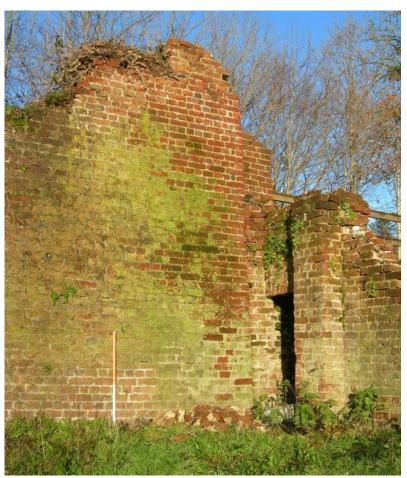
West wall of the south garden ramped up to the ruined summer house Note the ivy-filled feature at the highest surviving point of the wall (see below)
